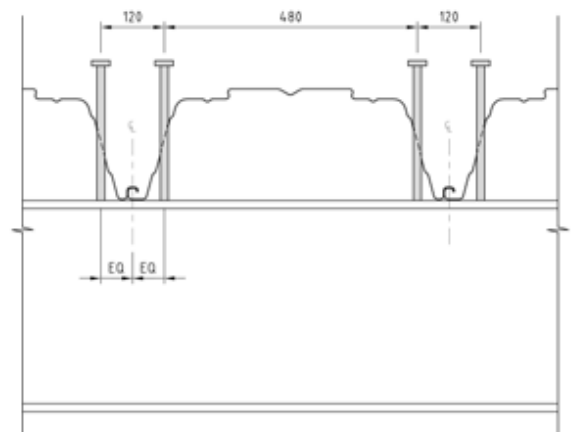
Shear stud layout in SlimDek 210® composite down-stand.
